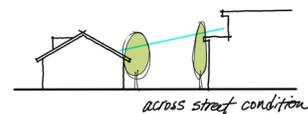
If a proposed building would be taller than adjacent development, upper floors should step back to provide transition in scale.
